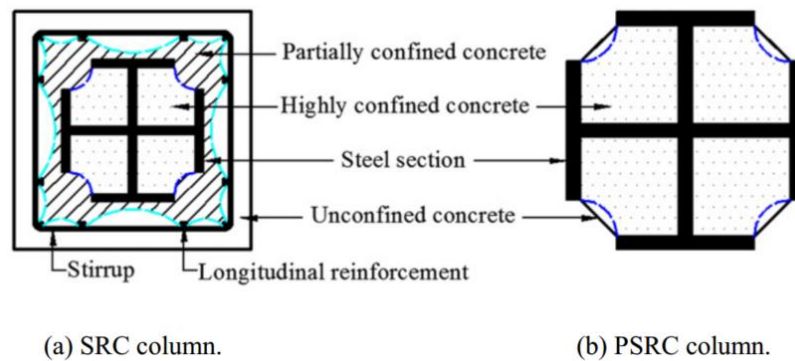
Materials and concrete confinement zone of concrete-encased steel columns (Chen and Wu, 2017).
